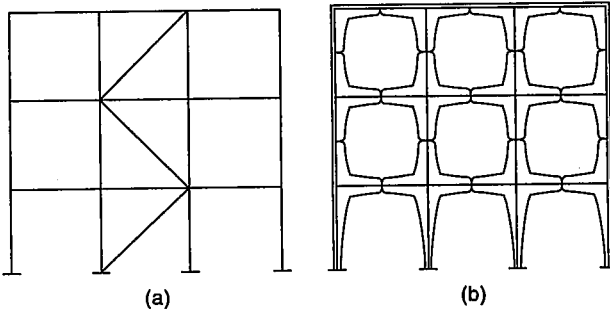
Frame system (a) linear system with braces (b) frame sub-assembly system
